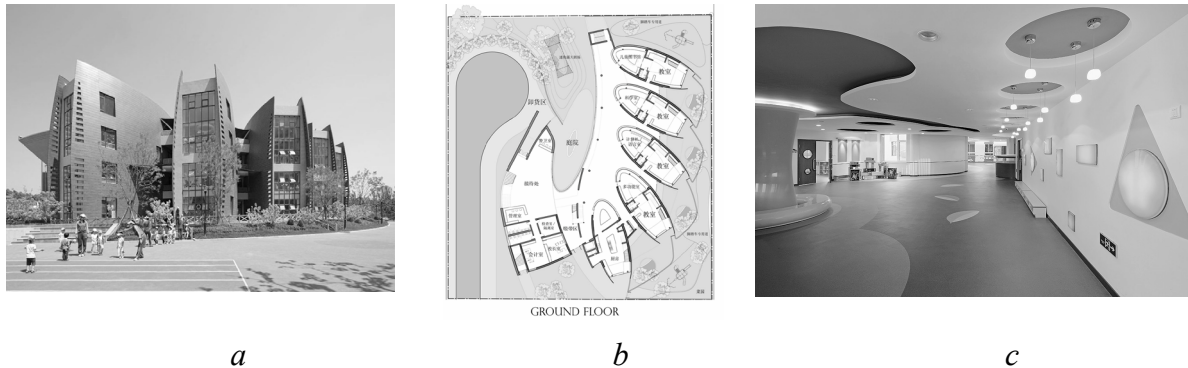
Kindergarten in Dalian, China: (a) – the main facade; (b) – the ground floor; (c) – view from inside
